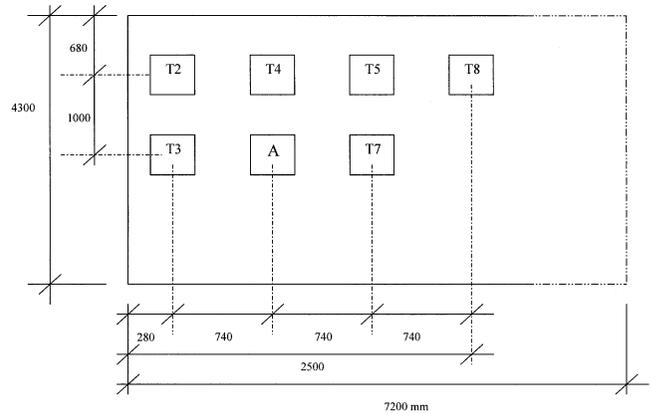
Positions of the tipping buckets T2-T5 and T7-T8 and aperture (A) on the short wall are shown.
